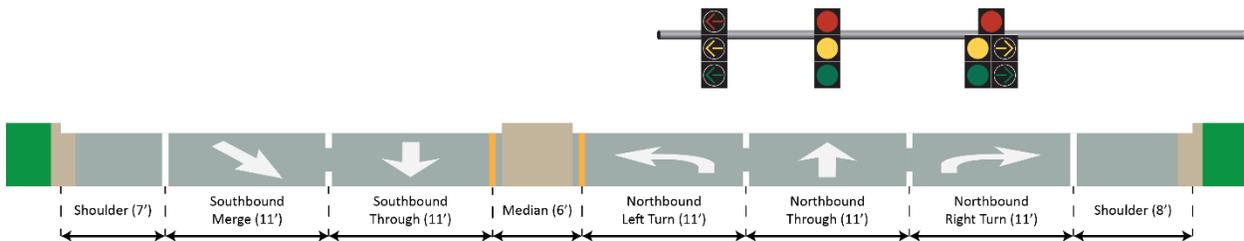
Proposed Typical Section, St. Andrews Church Rd south of FDR Blvd
